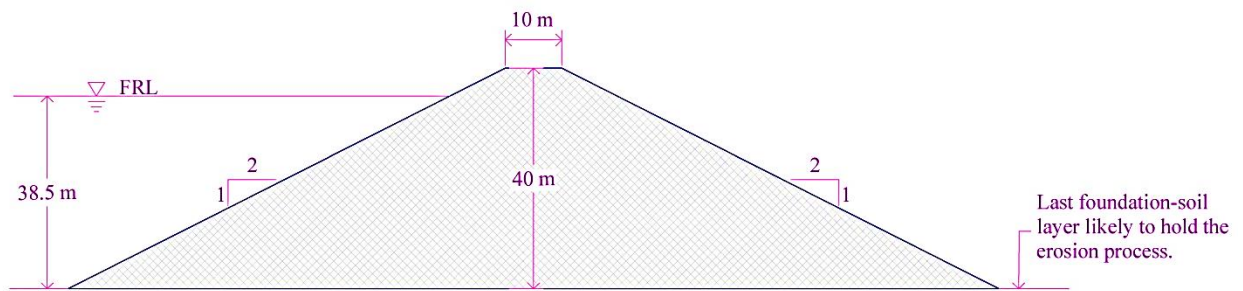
Cross Section for Example Application No.1. Embankment Dam Breach
